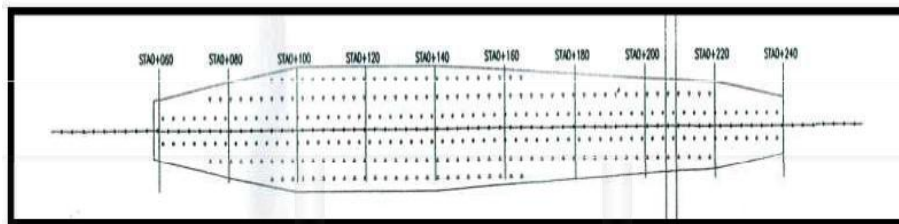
Design of the Initial Grouting Point Drilling Plan
